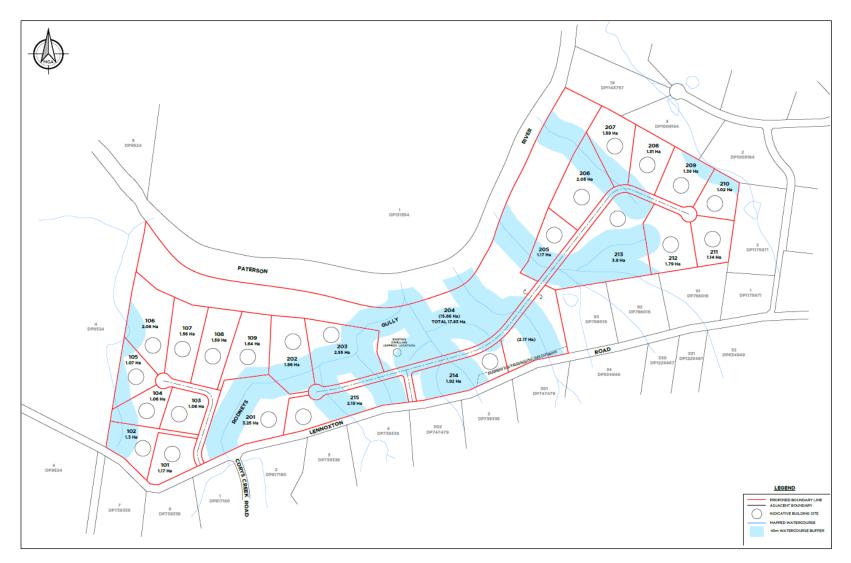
Subdivision Plan (Delfs Lascelles, 2024)
